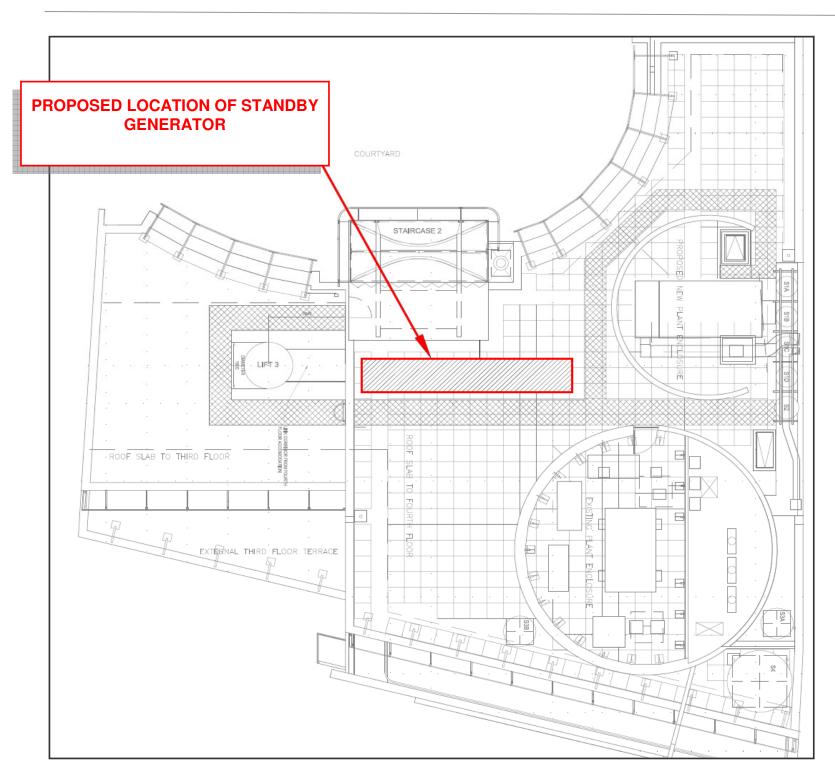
Roof Plan of "The Iceworks" (Not to Scale)
